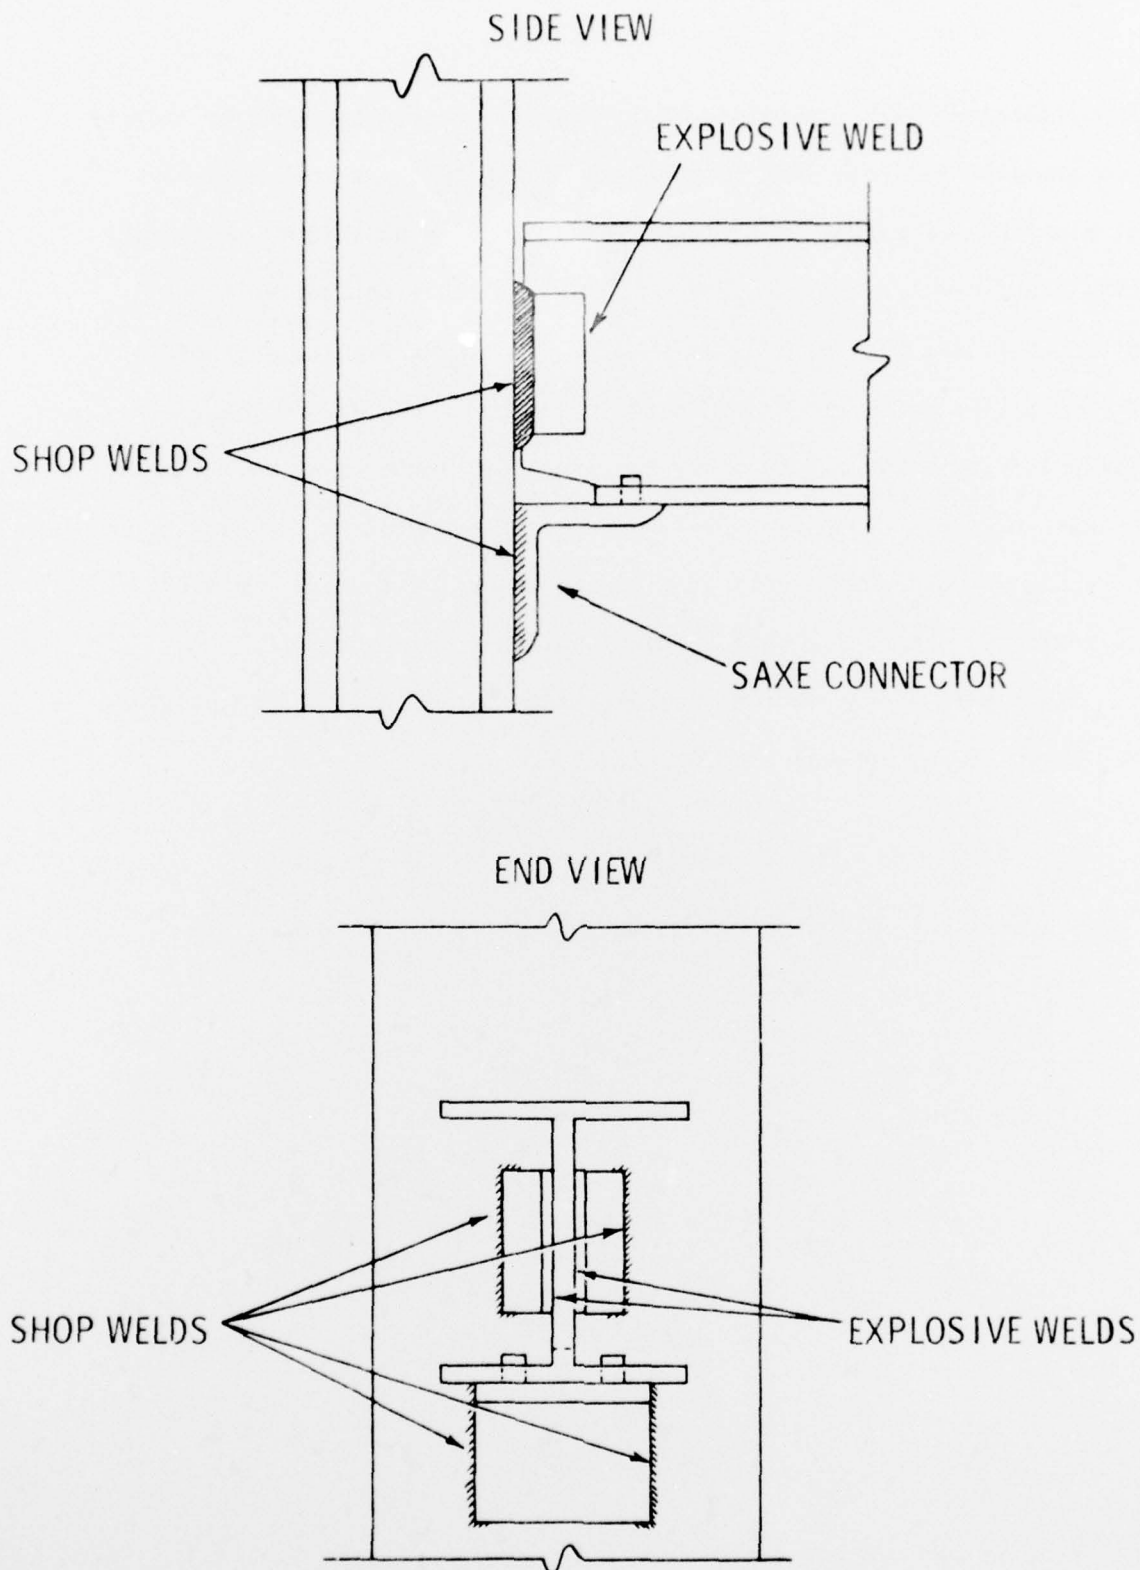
Application of Symmetrical Explosive Impulse Welding Configuration; Shear Connector
